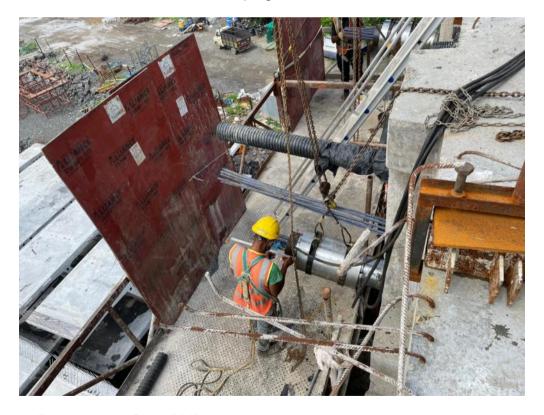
Span RMP 280-281 - 1st stage stressing work in progress
